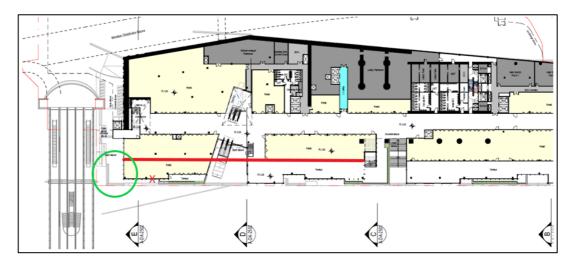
Recommendations to improve curtilage from the promenade. Red line – recommended building setback
